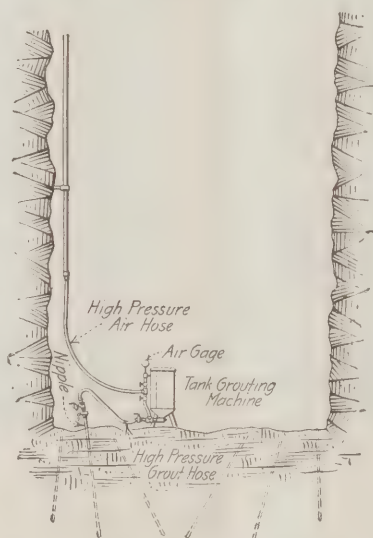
SHAFT BOTTOM, SHOWING ARRANGEMENT OF GROUTING DEVICE
